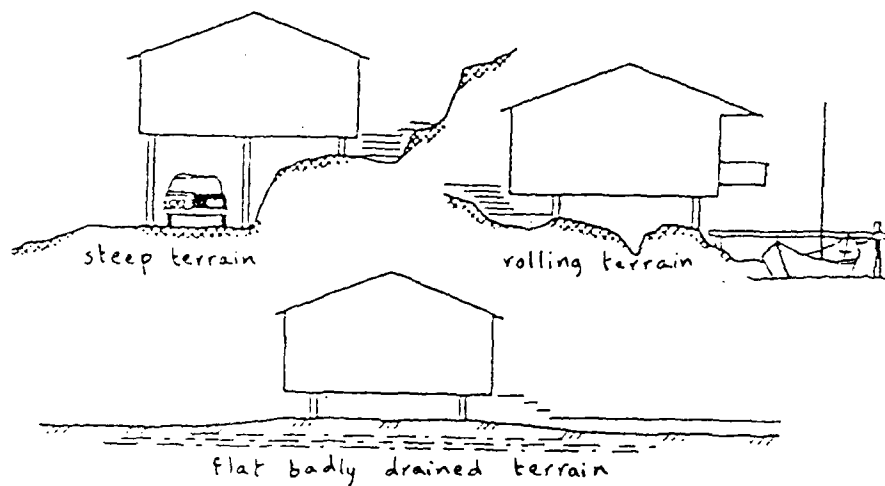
A house on piers is specially suited to places with steep or rolling terrain or on ground with bad drainage conditions.
